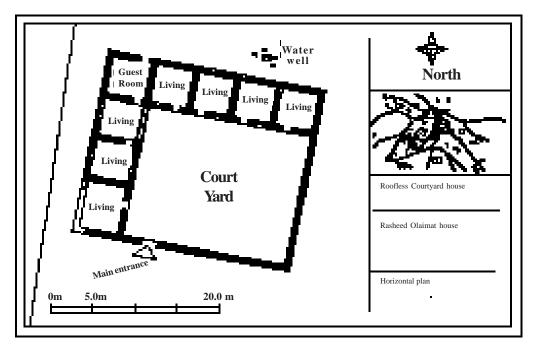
Horizontal plan of Rashid Olaimat house as example of courtyard house (Drawn by authors)
